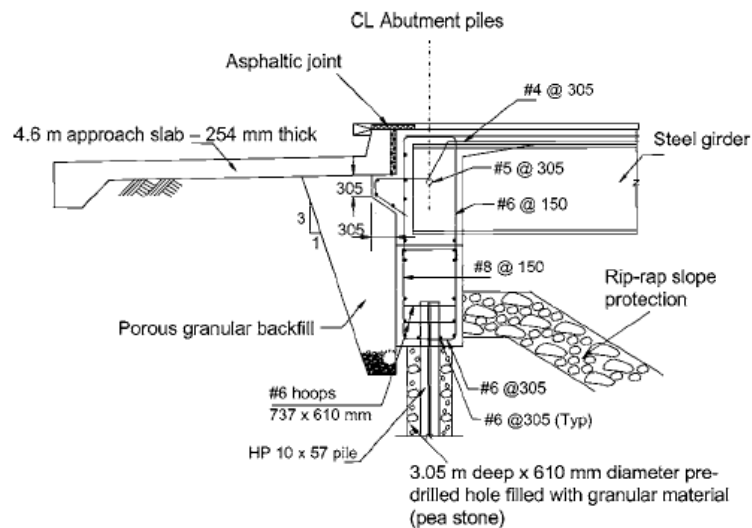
Massachusetts OW Bridge abutment and approach slab details [22].
